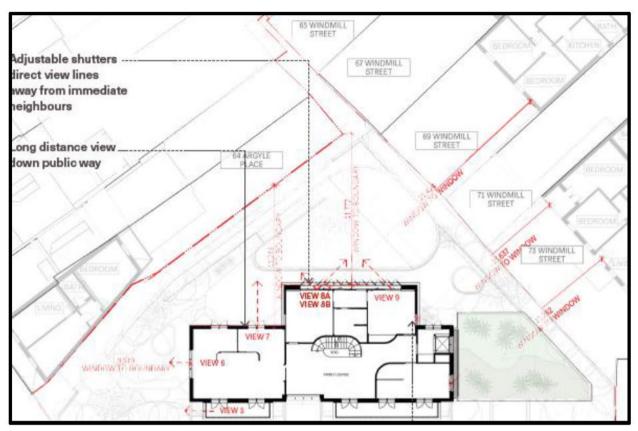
Privacy Impact Study - First Floor - (Source: Andrew Burns Architecture)
